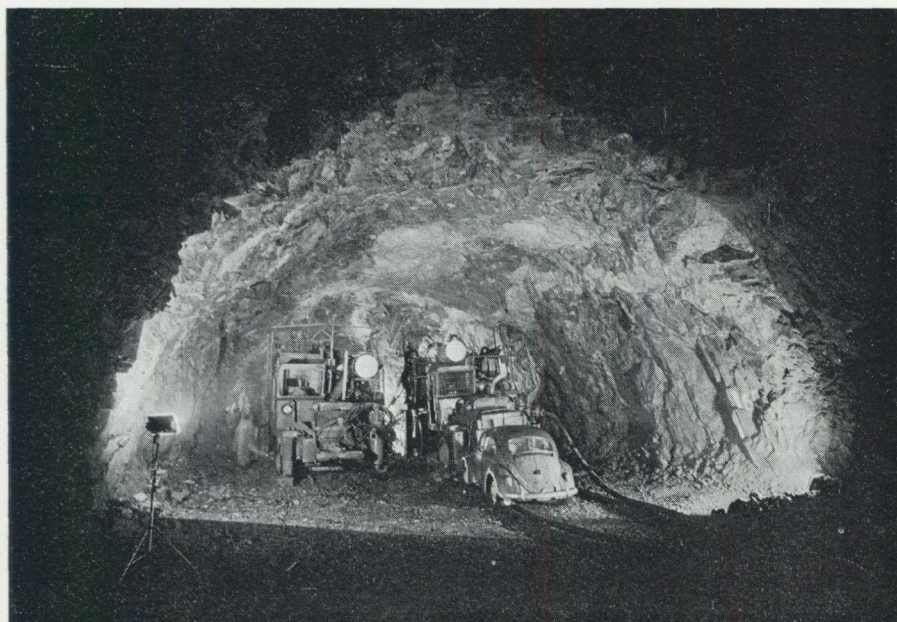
Cross-section of the top heading of the tunnel. (Photograph by G. Hansson.)
